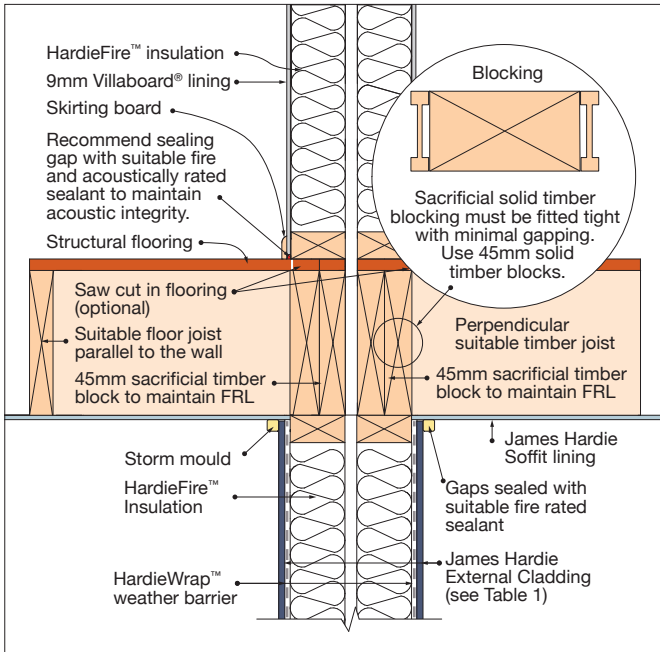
HARDIESMART™ BLADE WALL FLOOR JUNCTION WITH HARDIESMART™ INTERTENANCY WALL ABOVE
